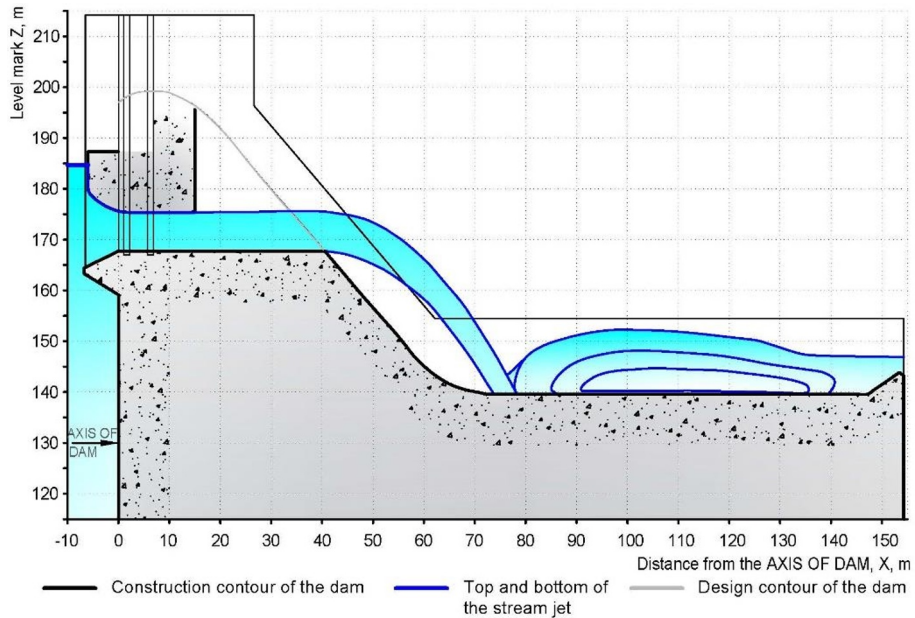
Longitudinal profile of spillway No. 2 for construction period with flow discarded and with pressure passage of water out from opening of spillway.
